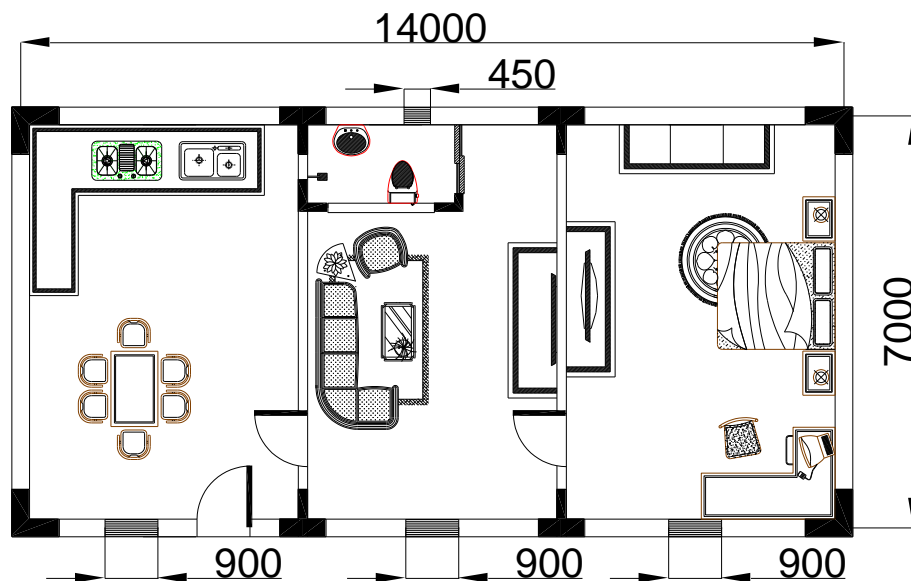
The floor plan and corresponding dimensions of the served house
